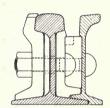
Section of Rail, Amsterdam Tramways.
